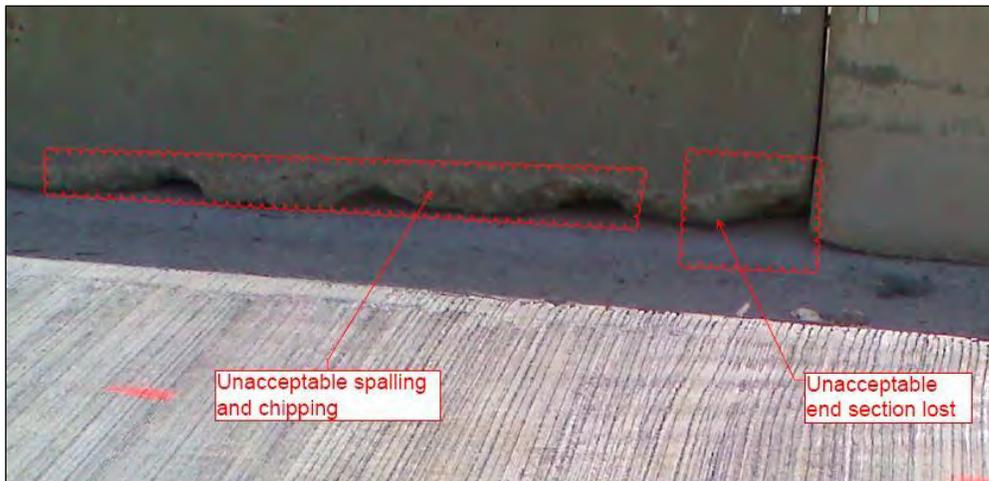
Unacceptable Chipping and Spalling
